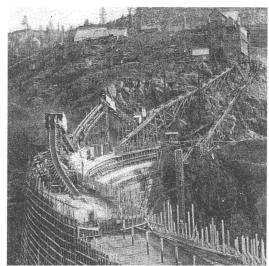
Construction of Spaulding Dam. Belt conveyor for concrete. (USA)
